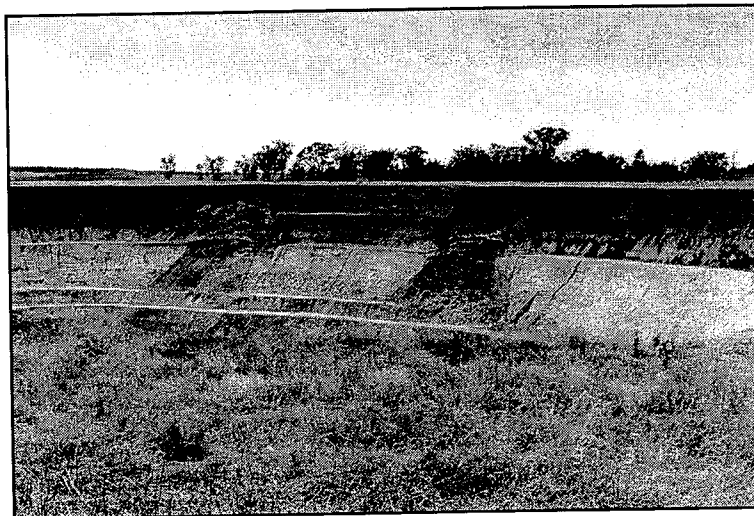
Wall Failure in Current Endeavour 22 Pit
